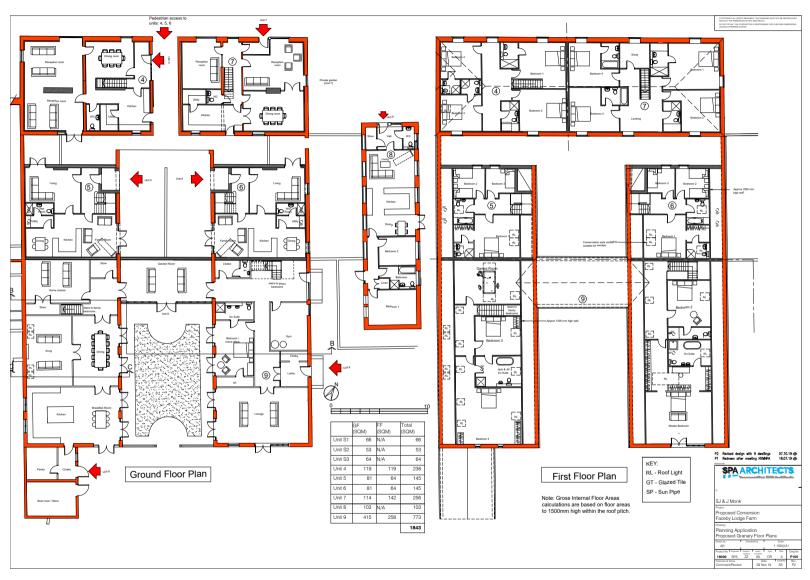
Granary Building and Piggery – Proposed Floor Plans
